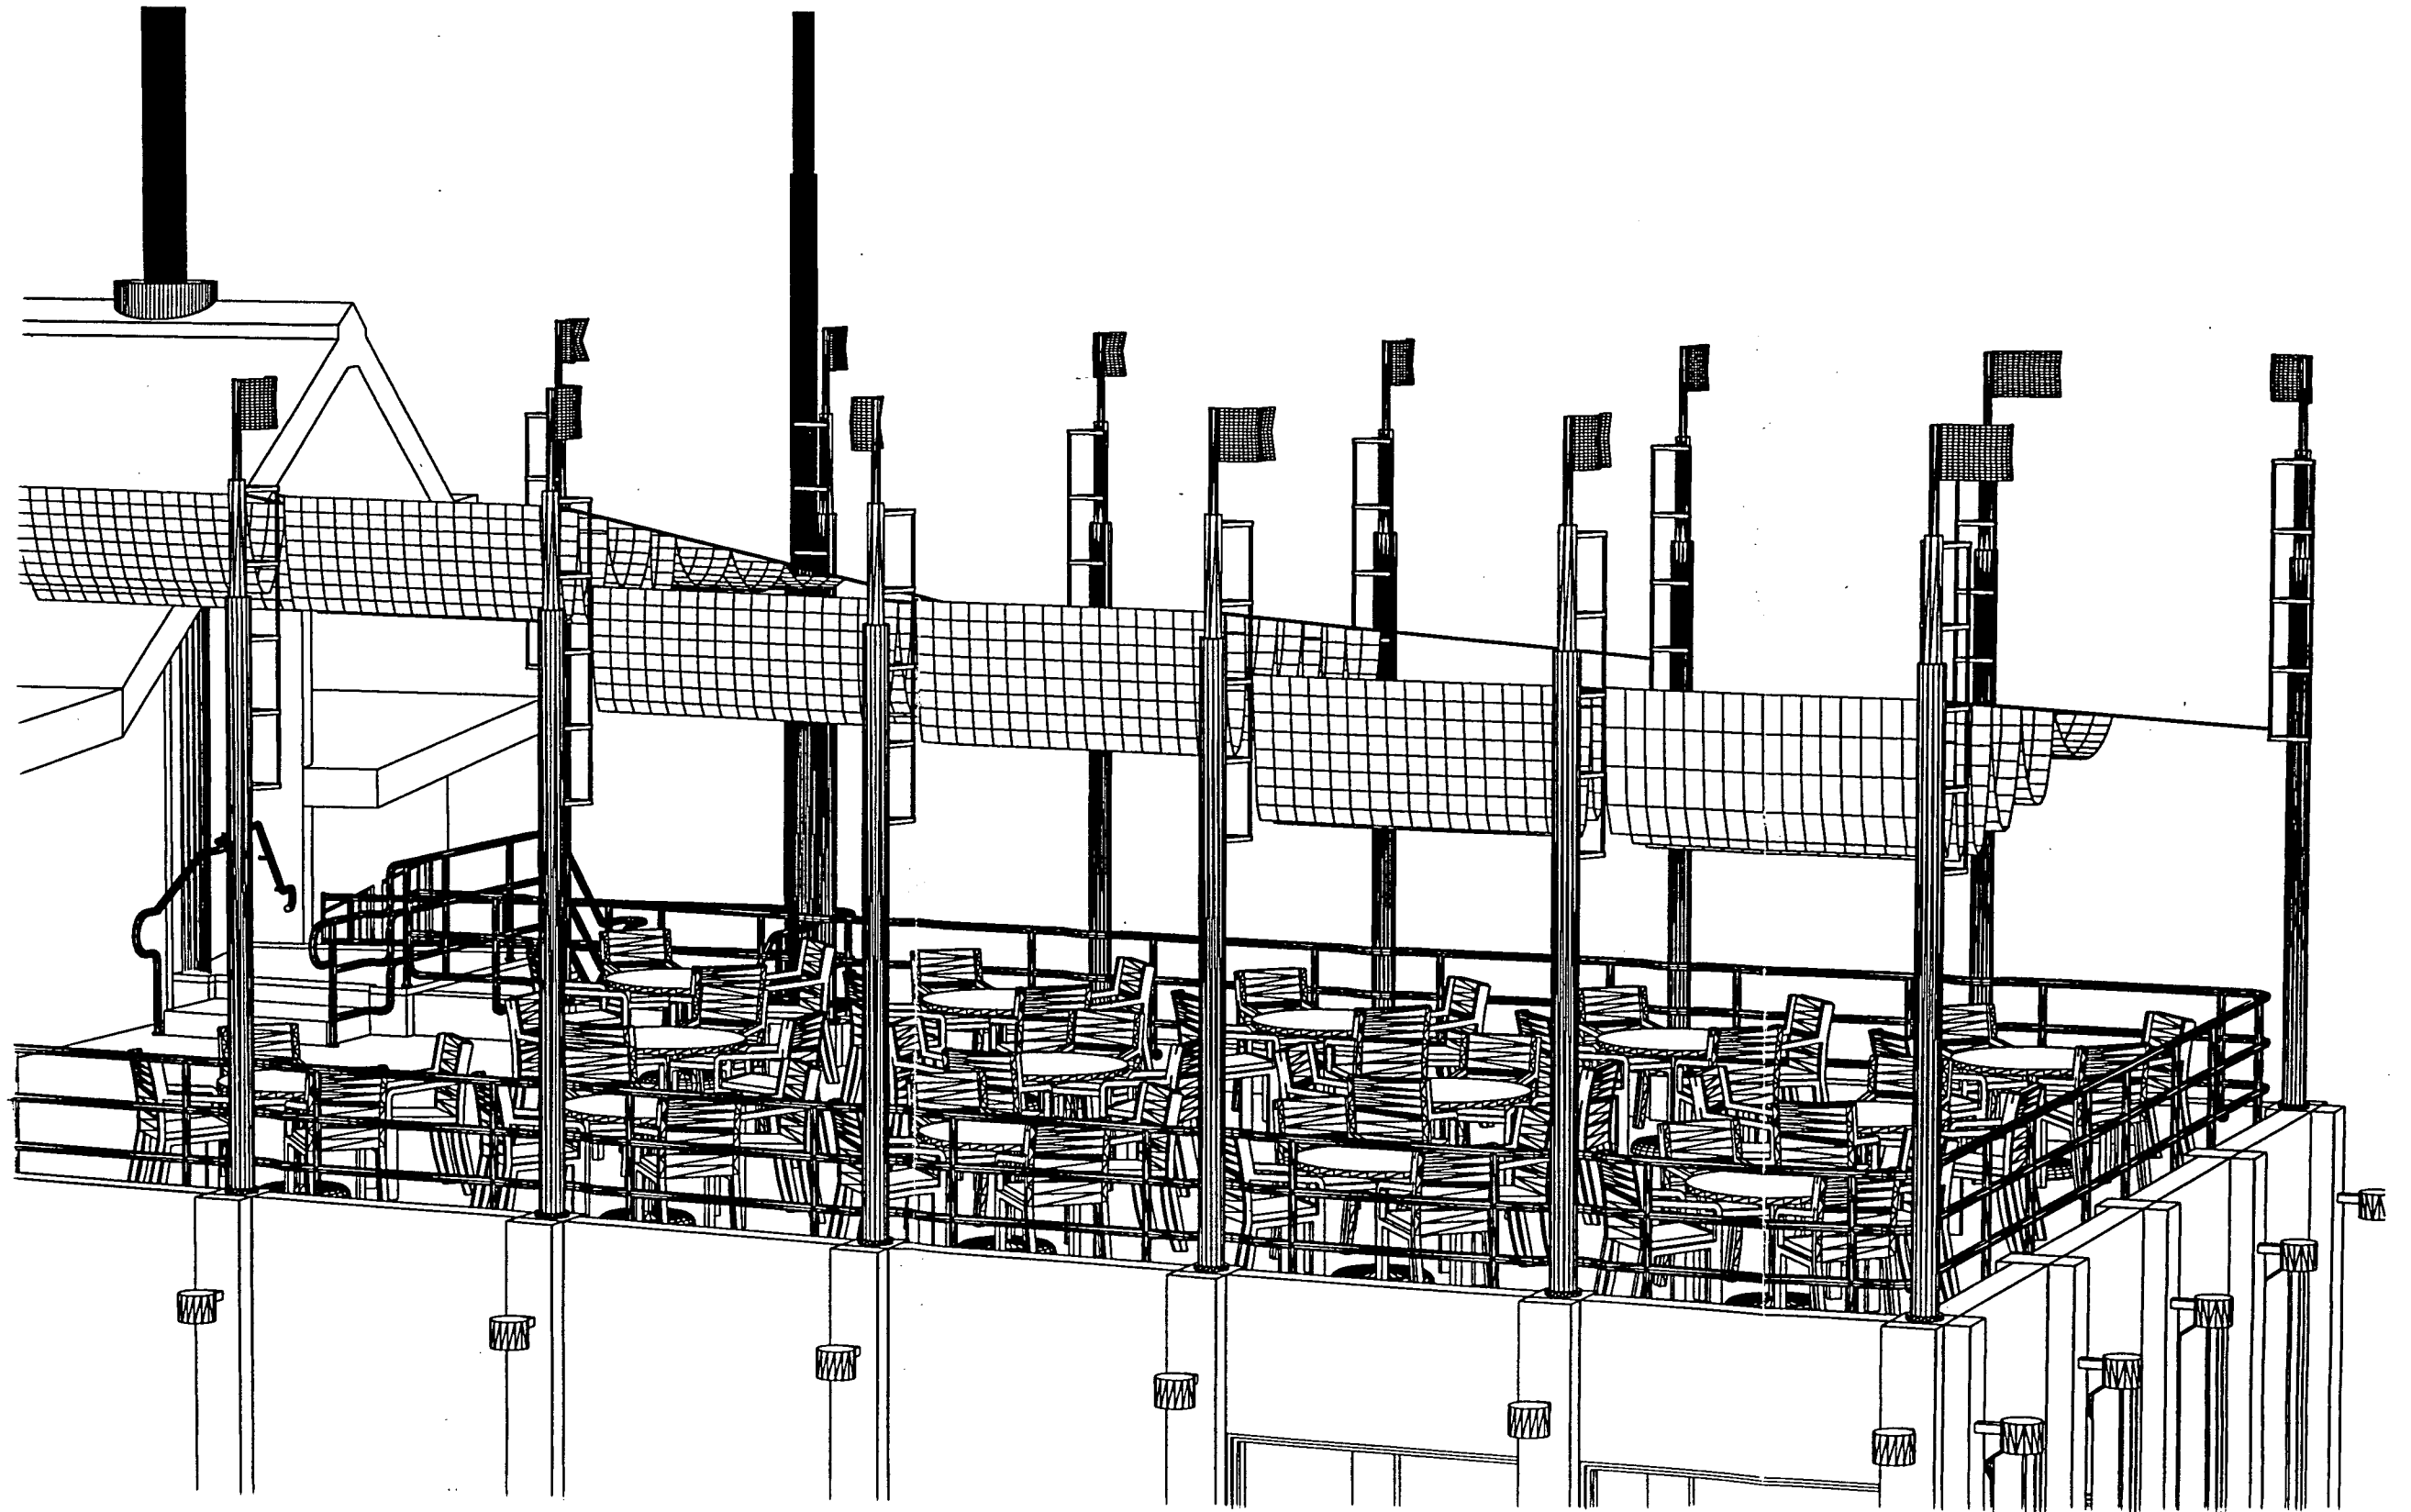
Exterior perspective view 2 -- roof top outdoor dining area.
